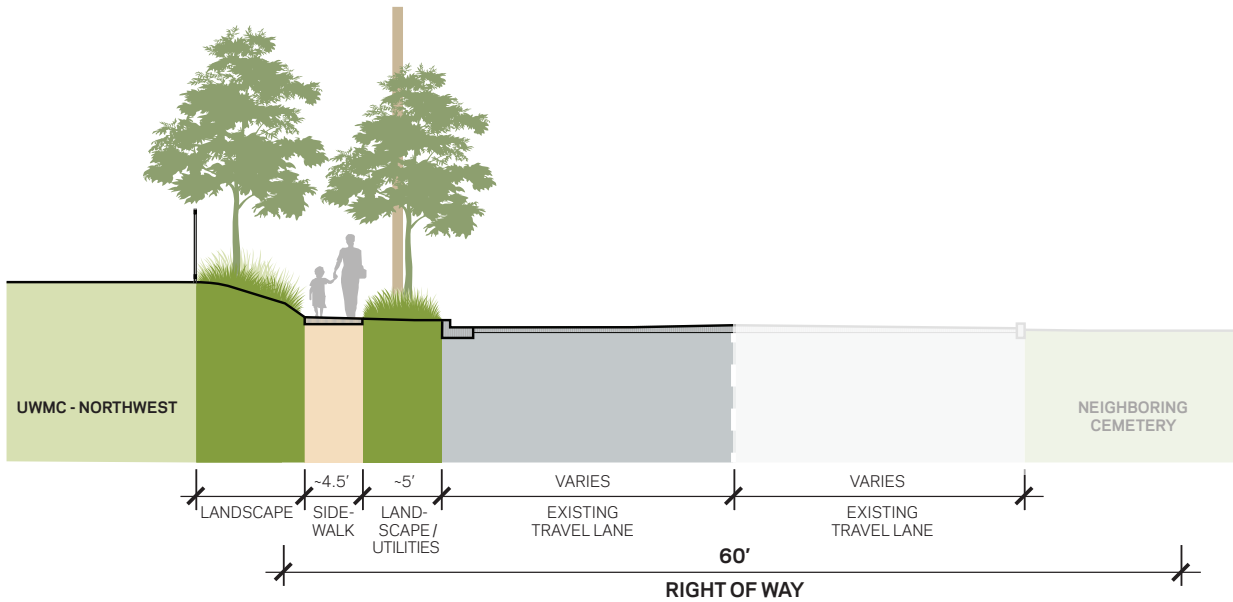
STREET SECTION AT N115TH ST - SOUTH CAMPUS EDGE, TYPICAL CONDITION
